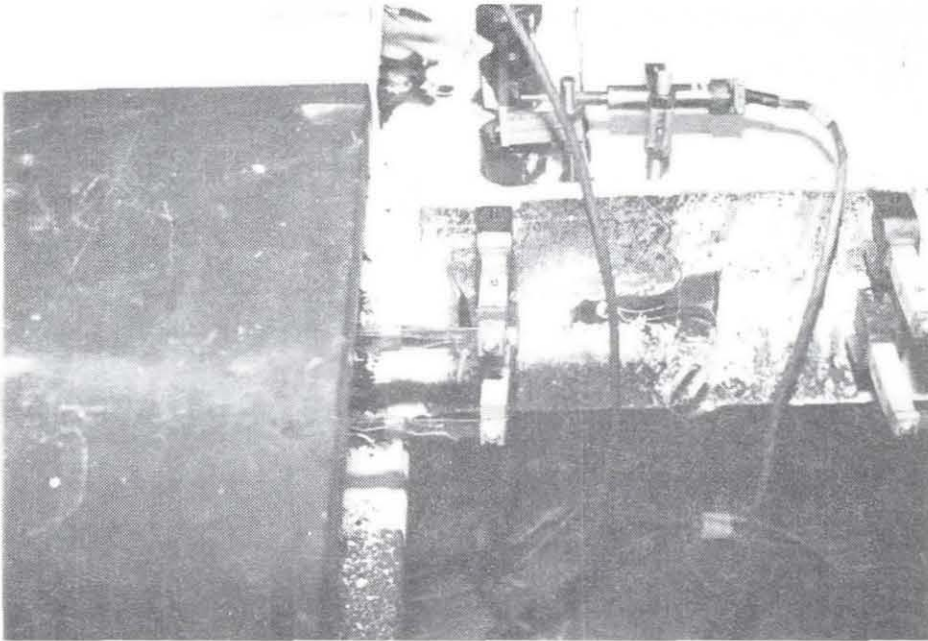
Crack Opened at Center of Top Flange (Specimen 2)
